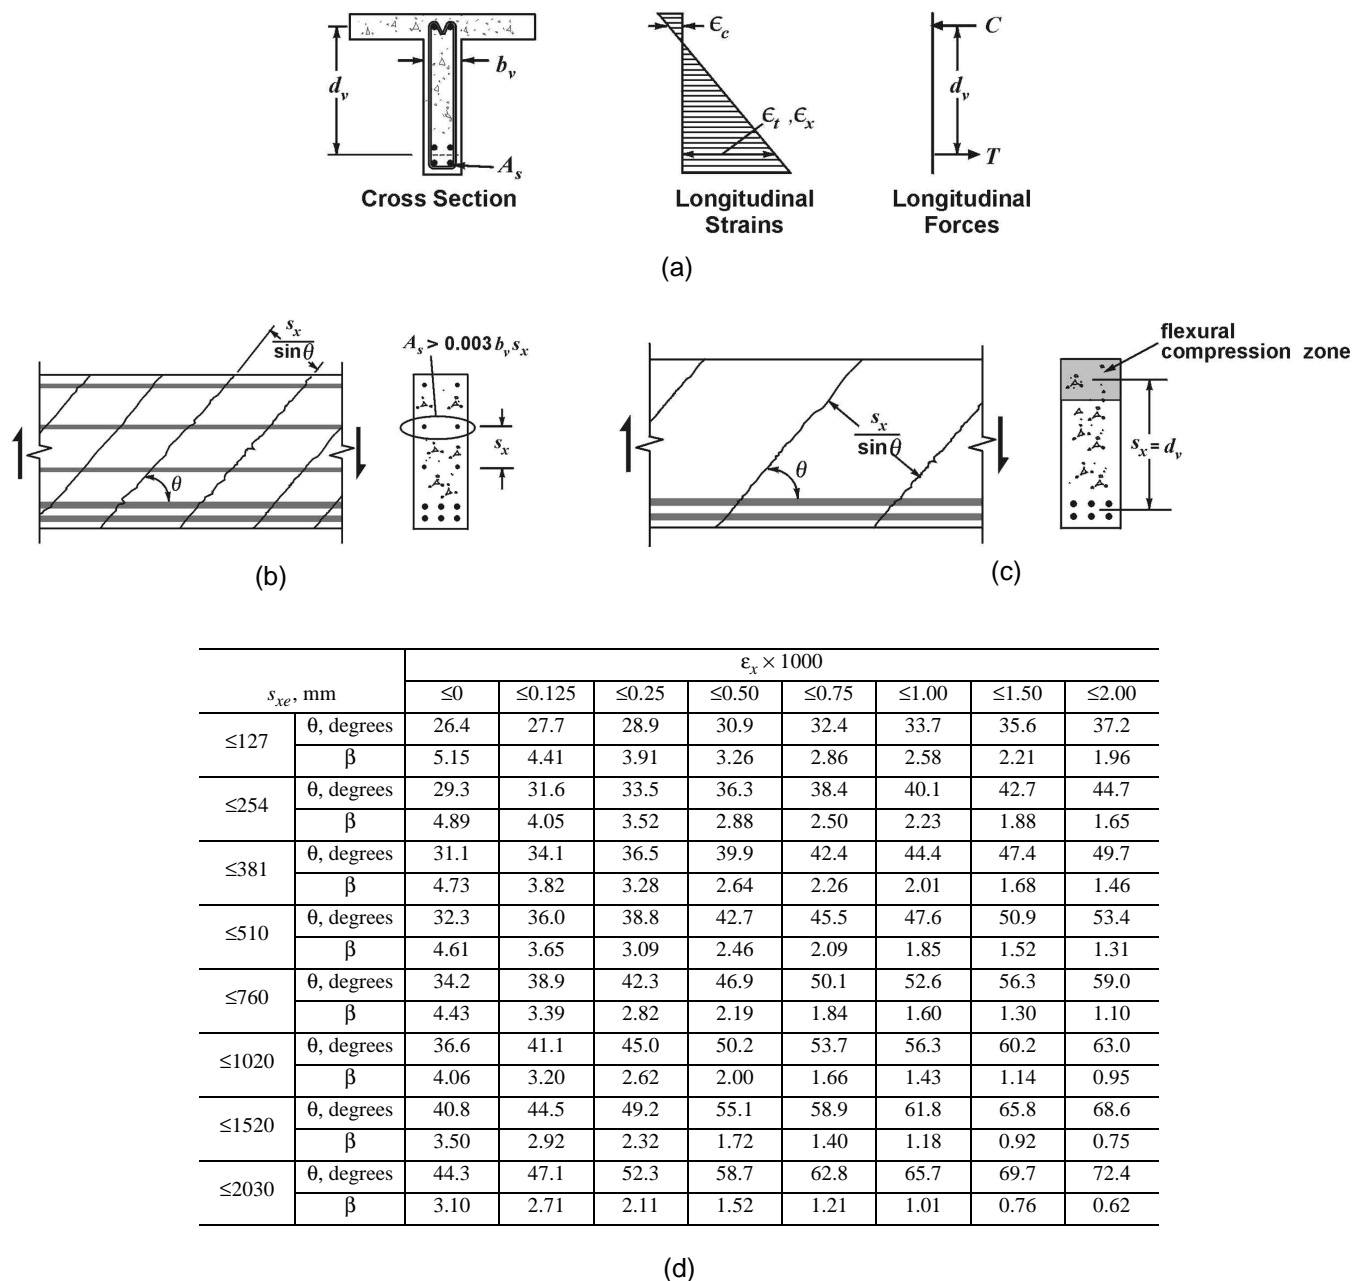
AASHTO provisions for beams with less than minimum stirrups: (a) location of ϵ_x for members without stirrups; (b) member without stirrups and with concentrated longitudinal reinforcement; (c) member without stirrups but with well-distributed longitudinal reinforcement; (d) values of q and b for sections without transverse reinforcement.
